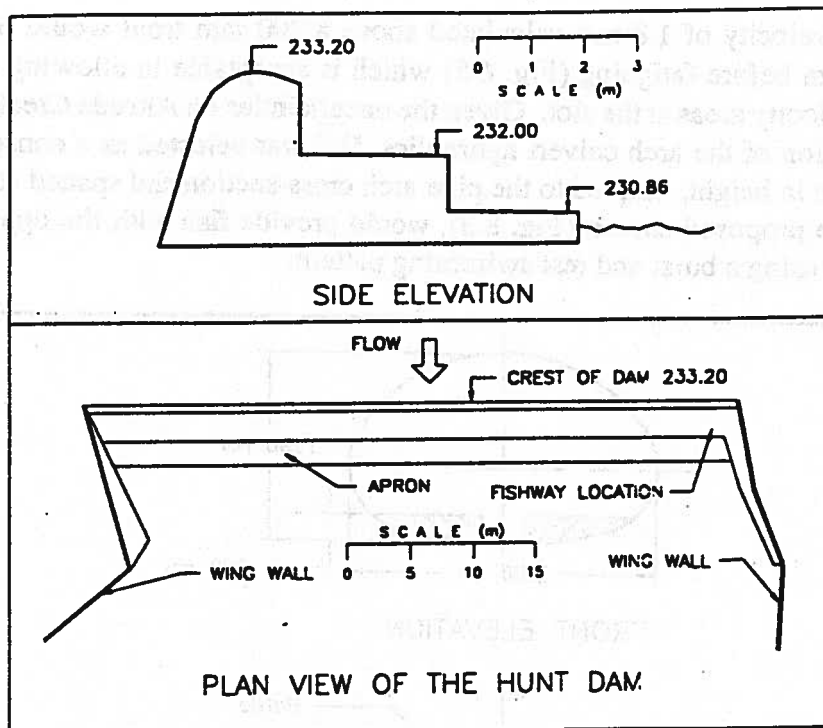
Side elevation and plan view of the Hunt Dam.
